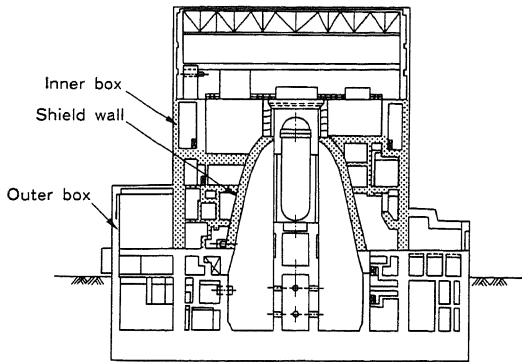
A Typical BWR Type Reactor Building in Japan.
